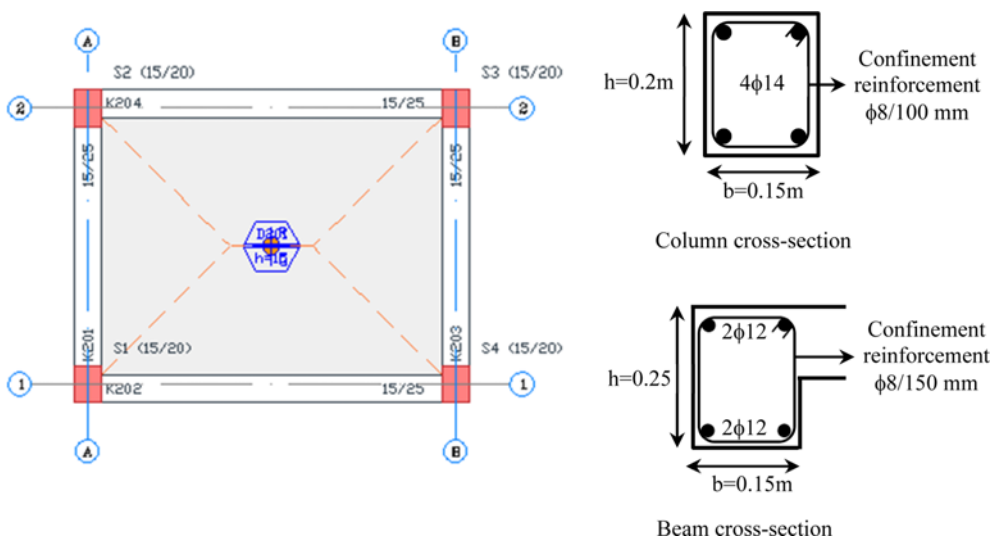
Plan Layout, Column and Beam Cross Section Details
